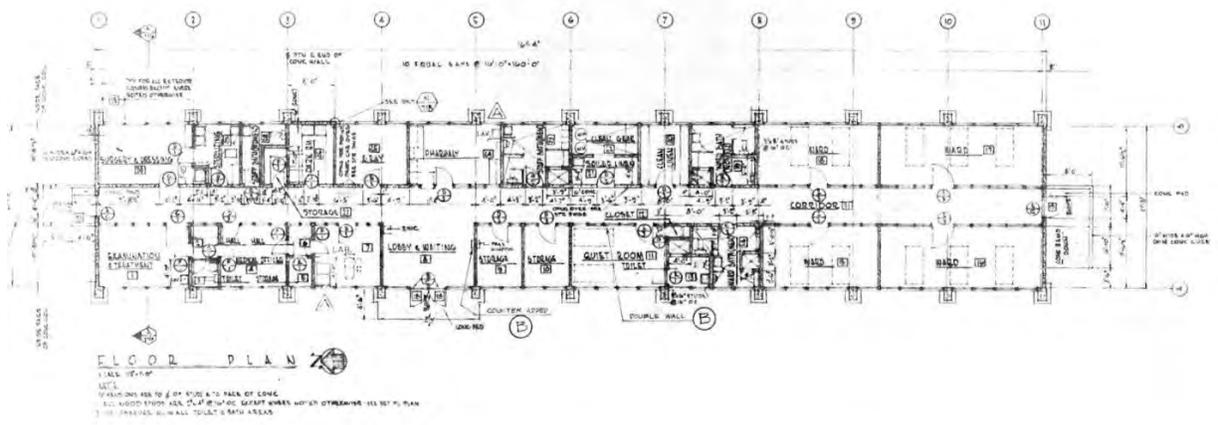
As Built plan view of Feature 75, the NTTU dispensary.
